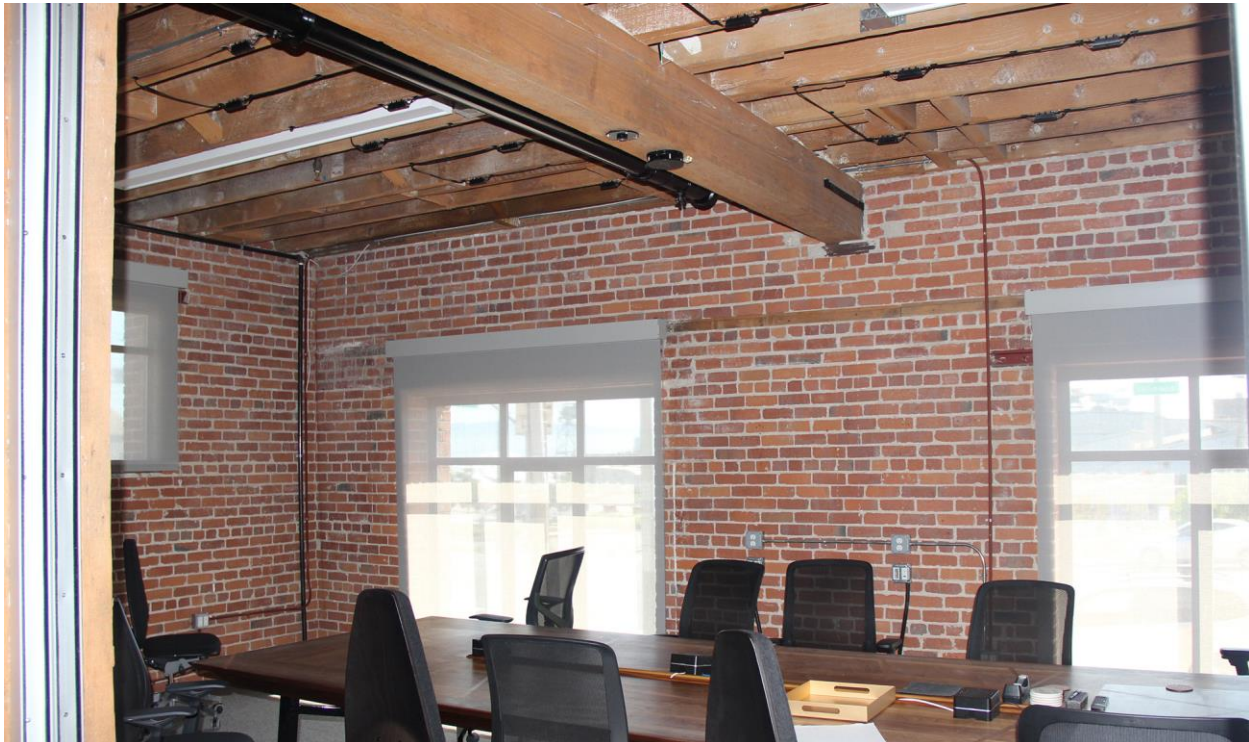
Exposed brick walls at the northwest corner of the first-floor level. Note the wood nailer between the windows.
